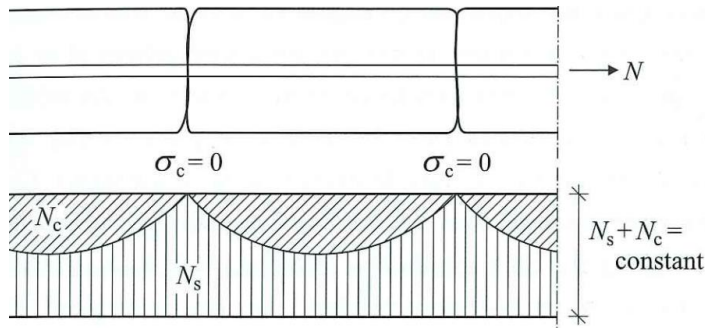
Force distribution in cracked reinforced concrete (Braam & Lagendijk, 2010).
